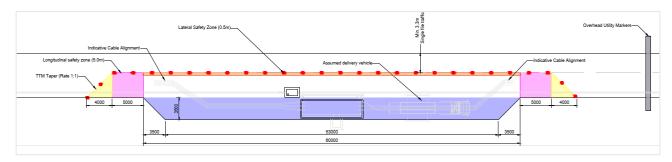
Proposed Traffic Management and Construction Platform Arrangement for a Joint Bay in the Road Verge (Indicative Layout)
